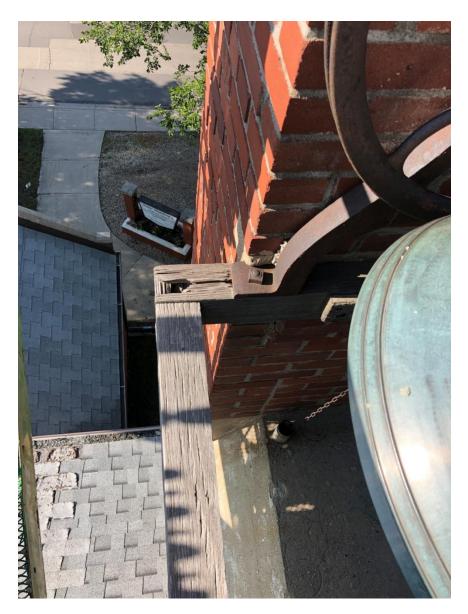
View of the Loose and Deteriorated Wood Member on East Side
